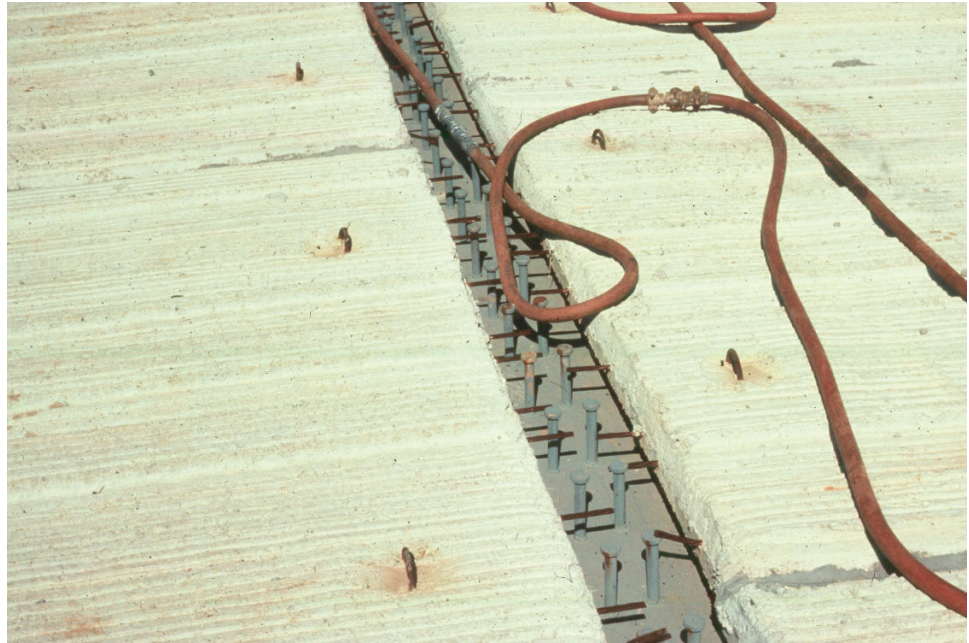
Precast Deck Panels (with Lifting Lugs Evident and Top Beam Flange Exposed)
